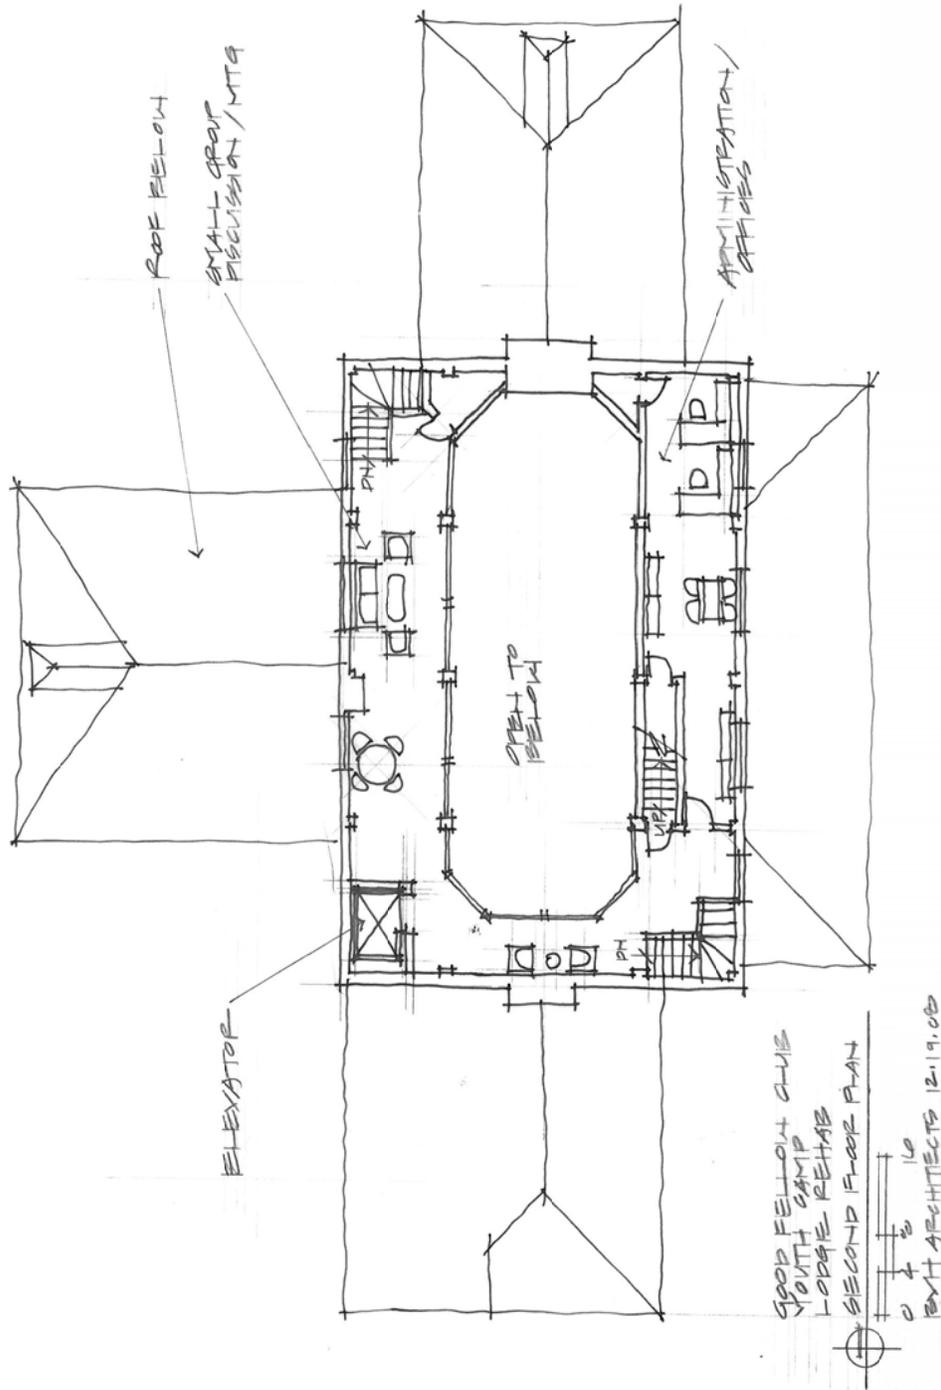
Lodge Rehabilitation: Second Floor Plan.
